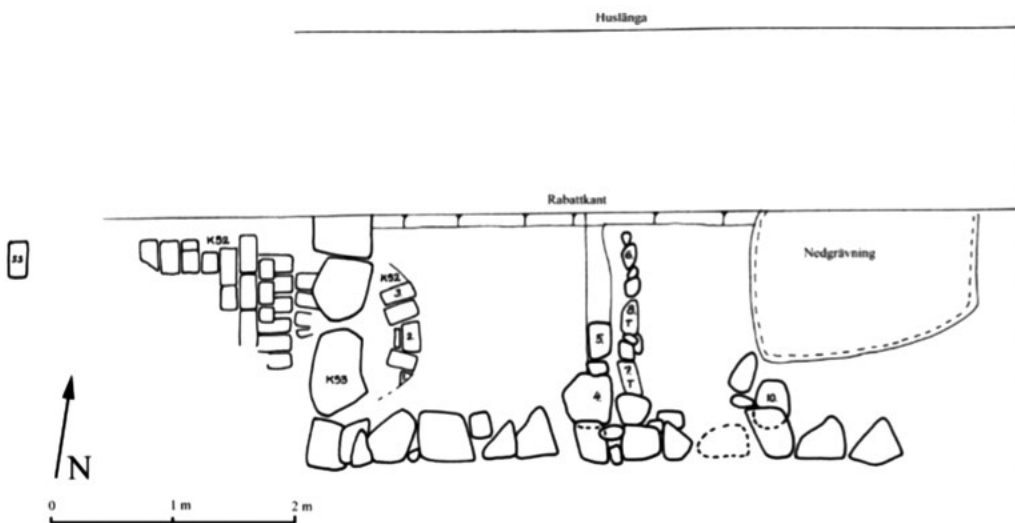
Kv. Västergötland 6. A plan over the sill stone foundation K 53 and the brick foundation K 52, in scale 1:40 (Fennö 2006: 19)
